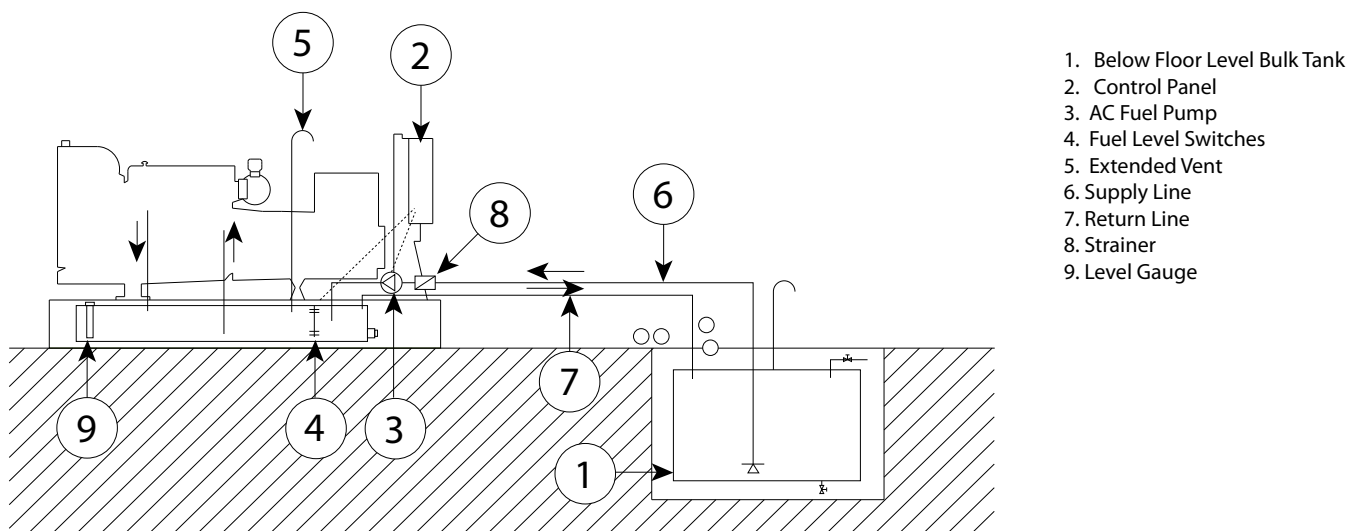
Typical Layout with Fuel System 1 (FK1)
